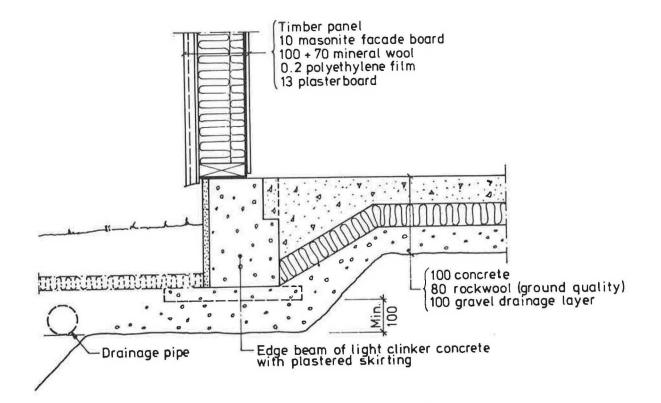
Example of a slab-on-grade from Sweden, showing wall and slab junction detail. A double-tube-profile rubber strip is used as a sill sealer to achieve an airtight joint. The light clinker concrete, used as the edge beam, has approximately the same thermal resistance as wood.
